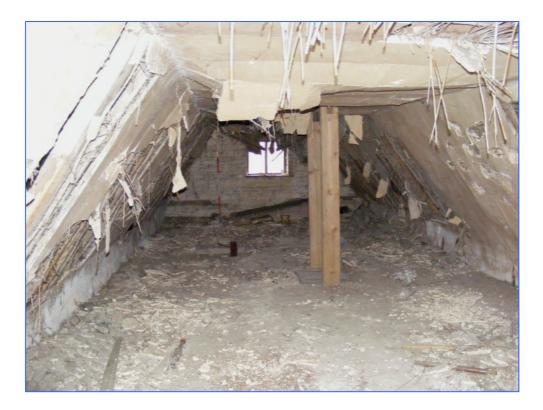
(Shot 52): Upper floor of Building B, looking east-north-east. In the centre of the shot is the hatch to the lower floor.
